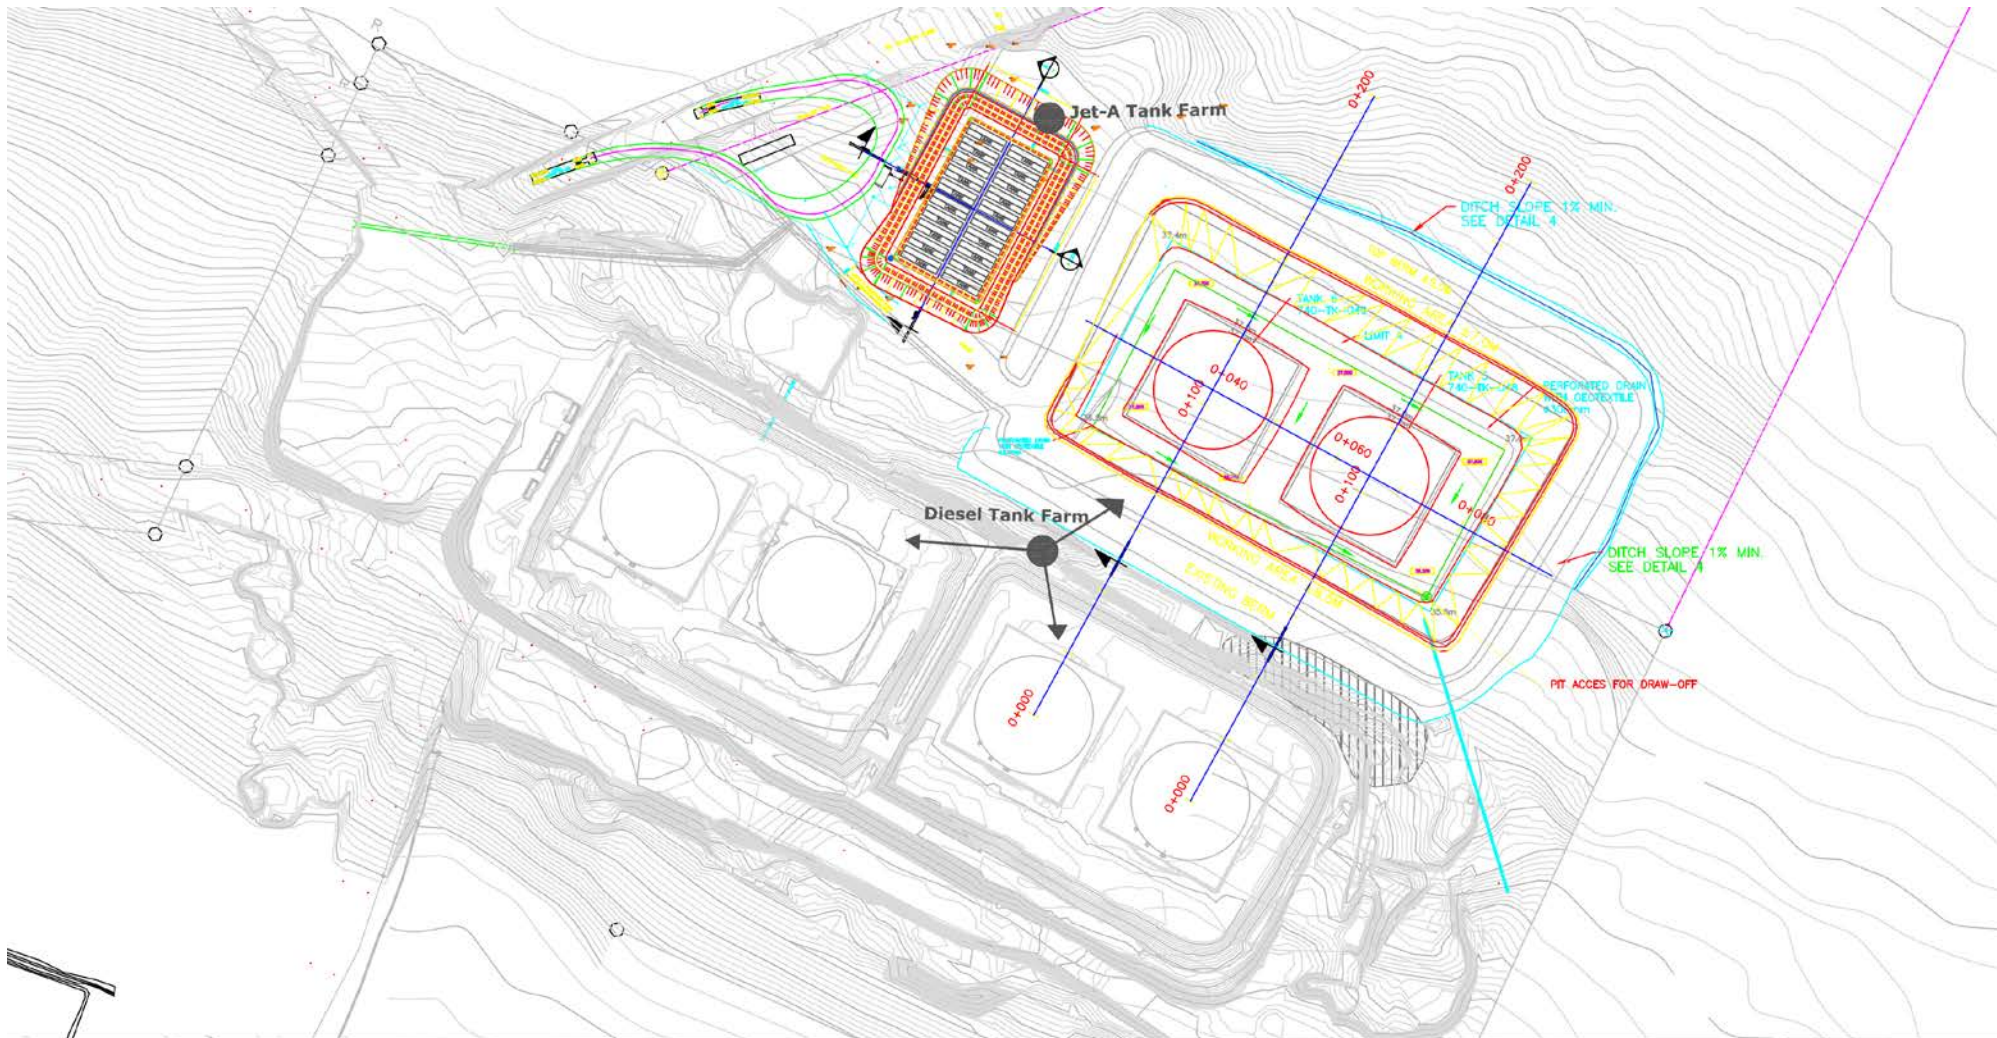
Baker Lake Bulk Fuel Storage Facility Site Layout
